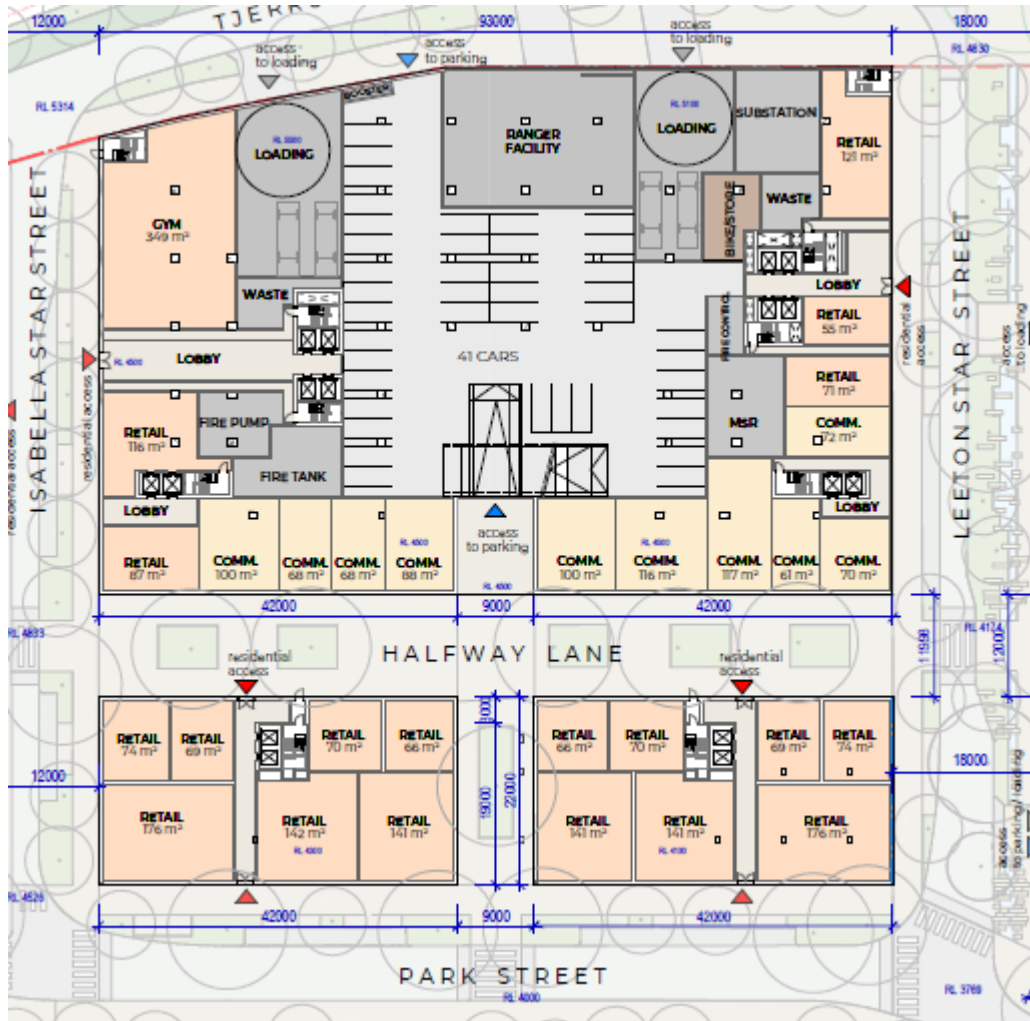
Indicative Ground Floor Plan for Buildings 3,4,5 and 6.
